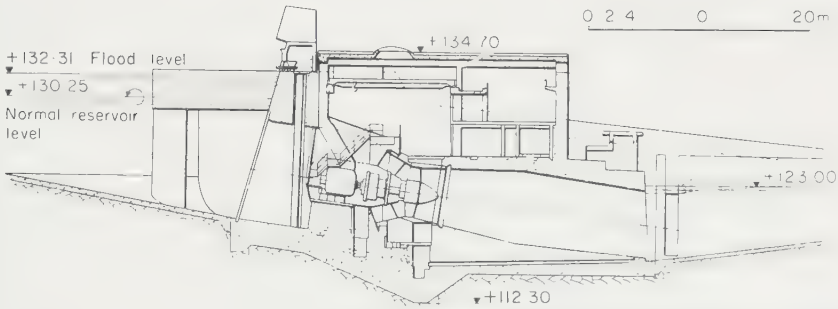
Cross section through Trier power station showing arrangement of tubular generating set.
